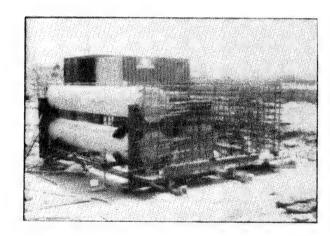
Four precast units showing arrangement of columns, Wallasey Cofferdam (from Barfoot 1987)
